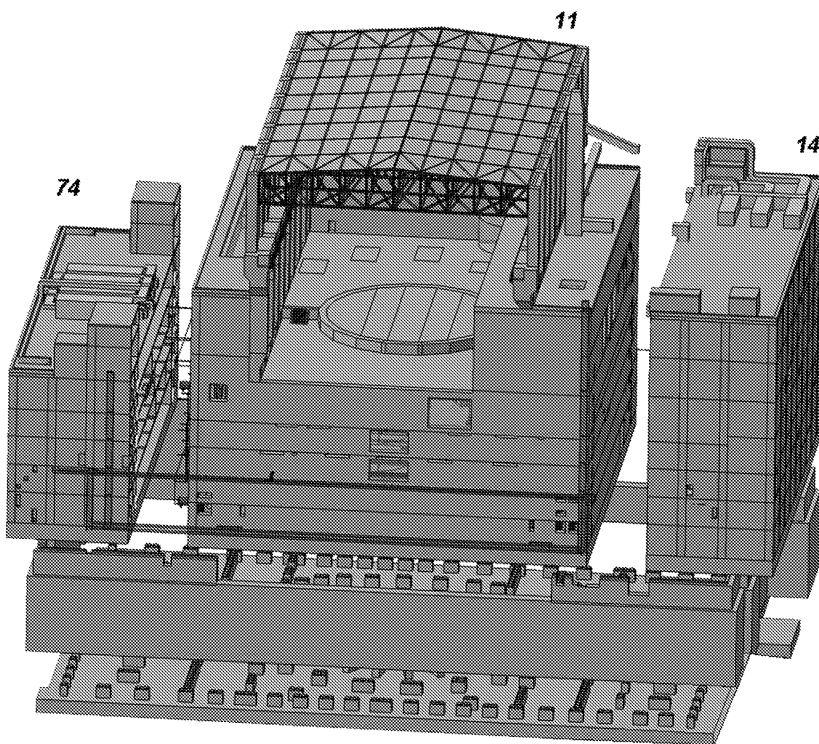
Exploded view of Tokamak Complex buildings located in excavation pit
